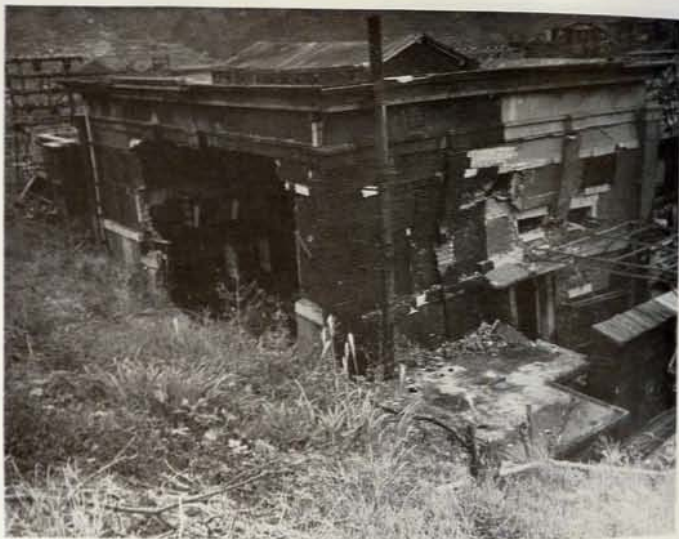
5,400 feet from GZ. East and north sides of control and switch buildings, Zenza Substation.
